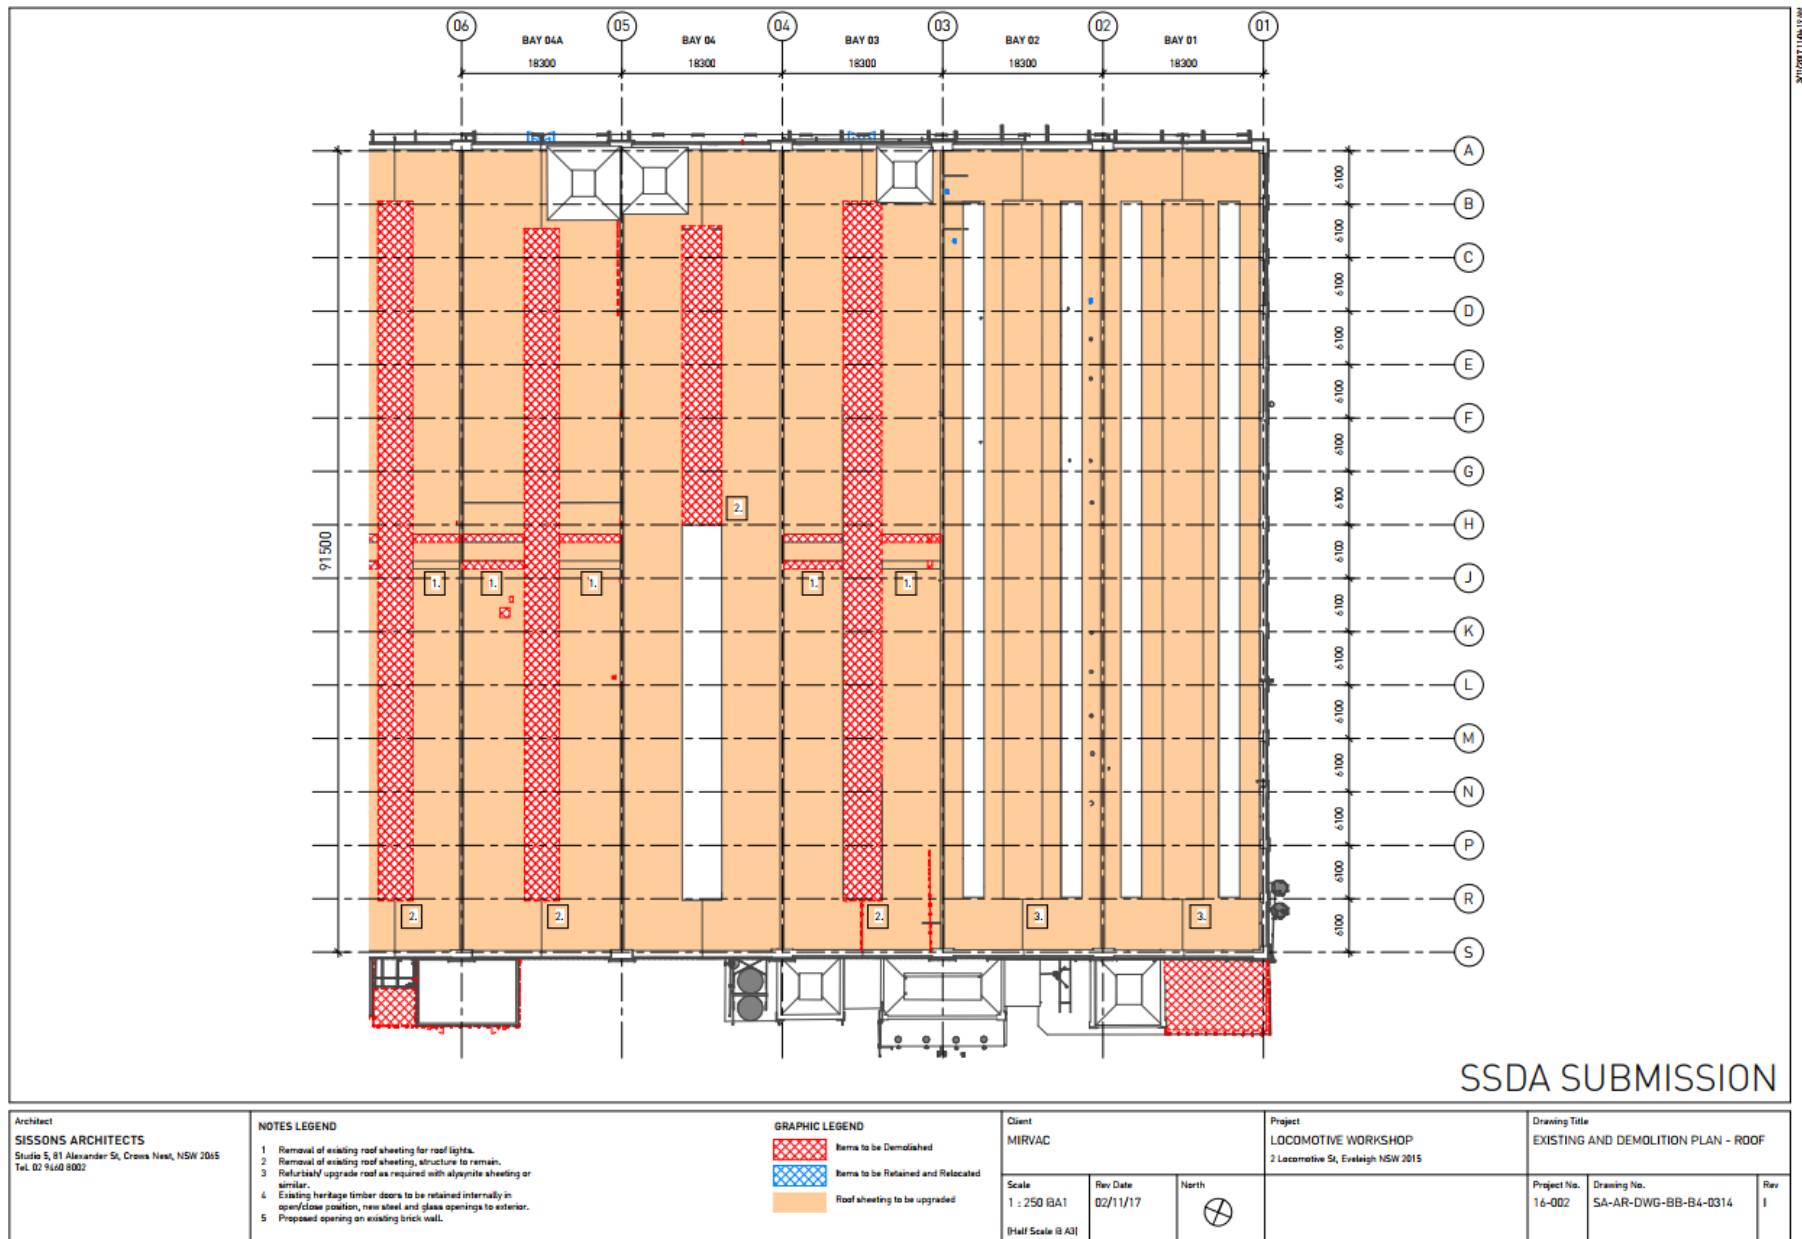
EXISTING AND DEMOLITION PLAN-ROOF (SOURCE: SISSONS, DRAWING SA-AR-DWG-BB-B4-0314, REVISION I, 2.11.17)
